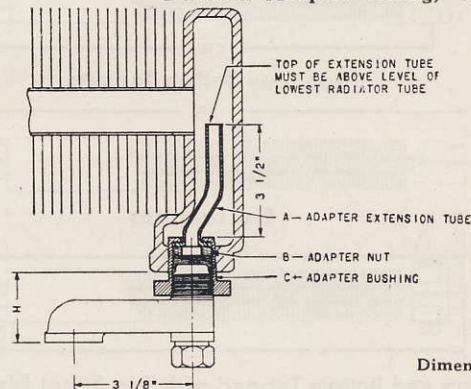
Sectional view of Adapter Fitting installed with Adjustable Regulating Fitting on a concealed radiator having an offset tapping $\frac{3}{4}$ " below lowest radiator tube.
